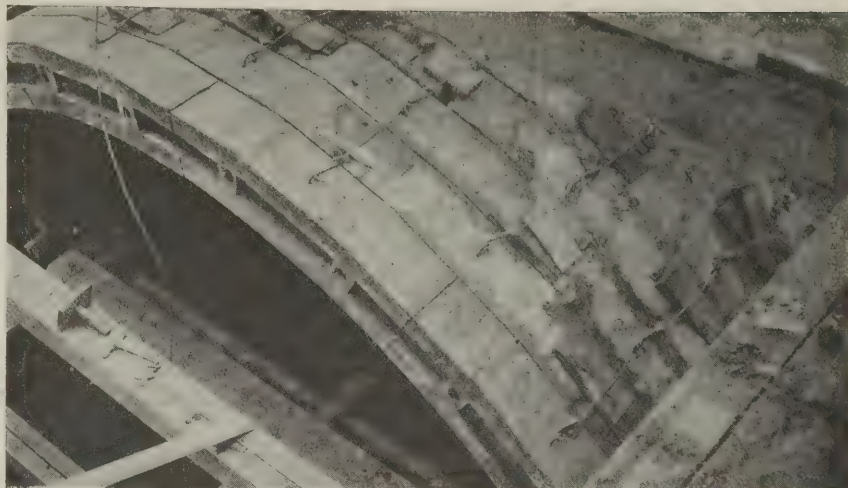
TUNNEL ARCHING IN UNIT BLOCK CONSTRUCTION.
